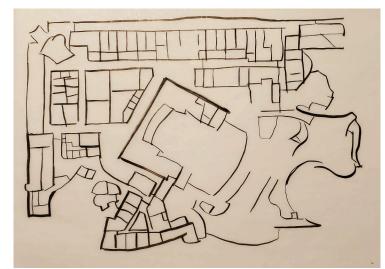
AUTHOR'S SKETCH OF FIRST FLOOR PLAN
